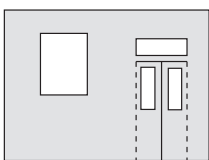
ATTACH FRONT BUILDING TO MAIN HALL.
